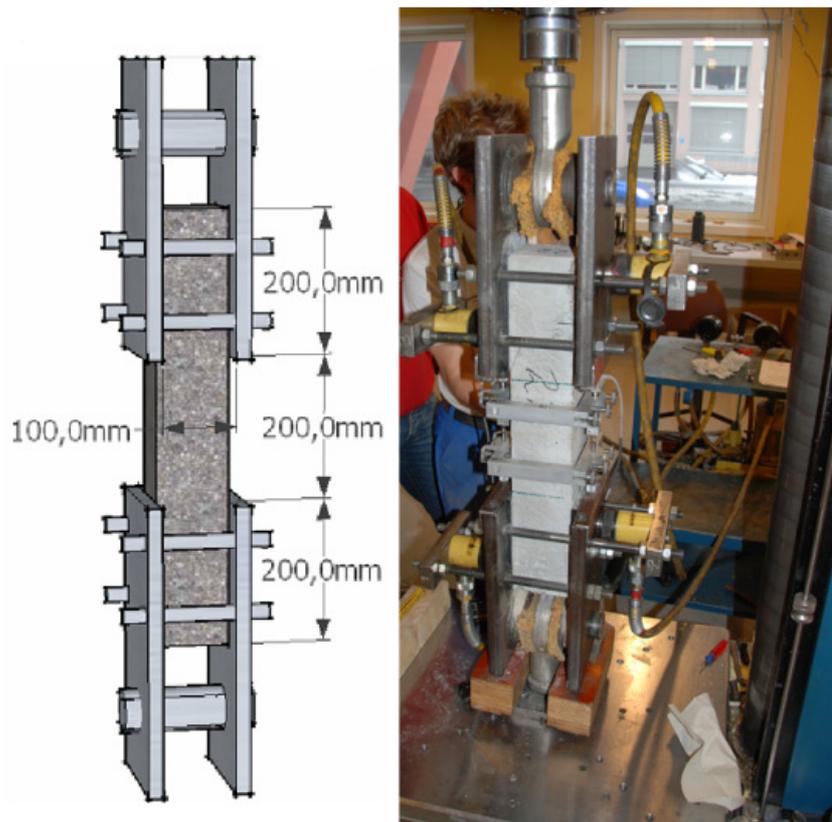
Left: Sketch of tension test arrangement [13]. Right: Photo of the tension rig used in the laboratory at NTNU.
